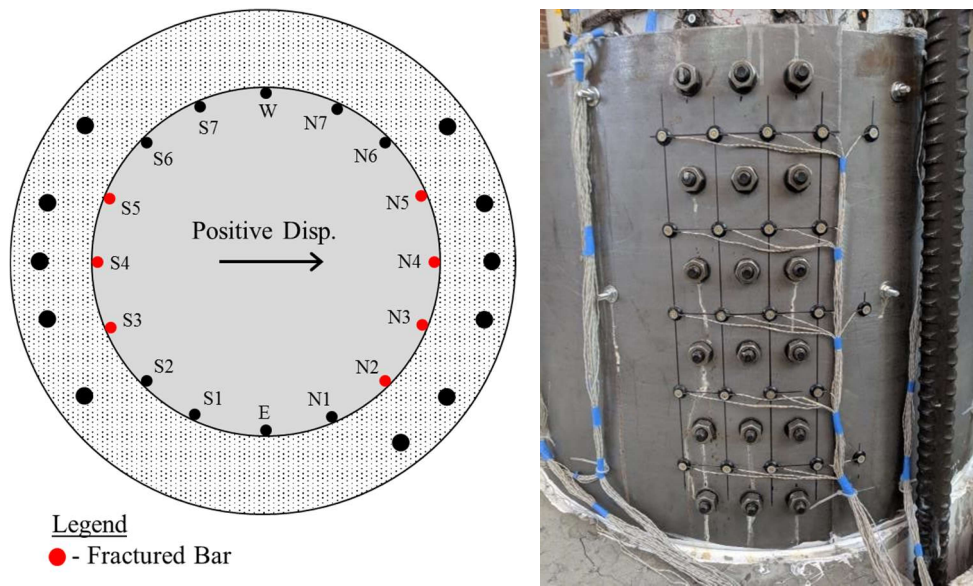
Repair Cross Section and Bolt Configuration for Repair #1.
